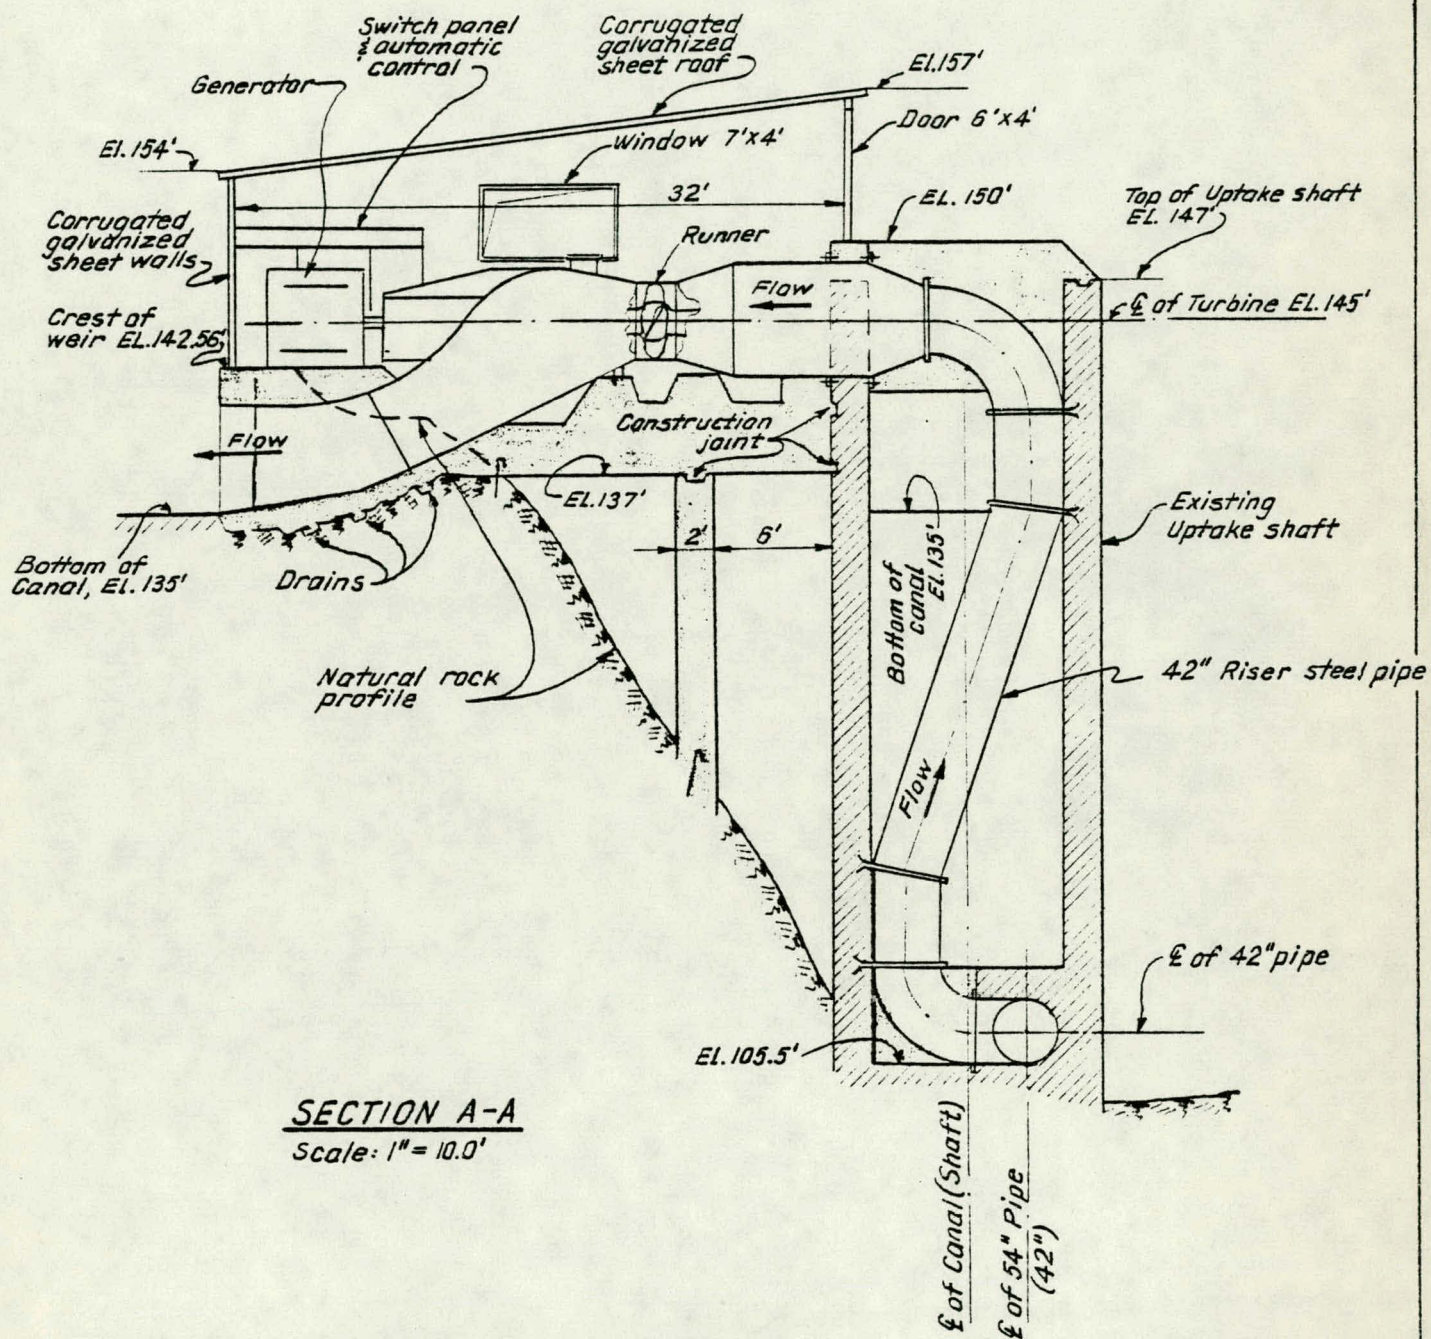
RETROFIT HYDROPOWER INSTALLATION at EARTH DAM OUTLET STRUCTURE
